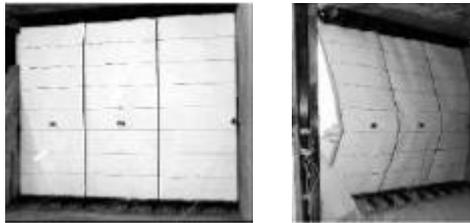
Sheet steel application pretest (left) and posttest (right) (Coltharp and Hall 2003).
